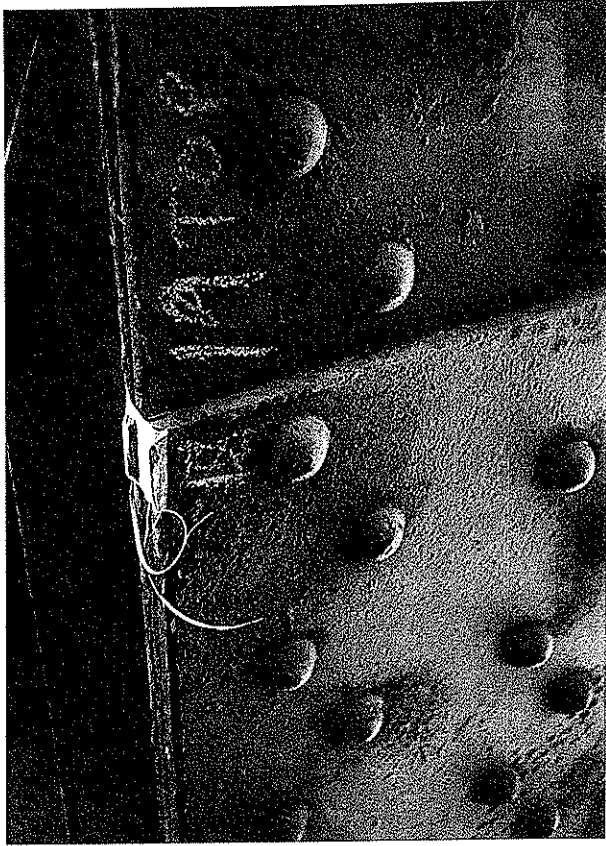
General Gage Locations in Through - Truss Swing Span 10
